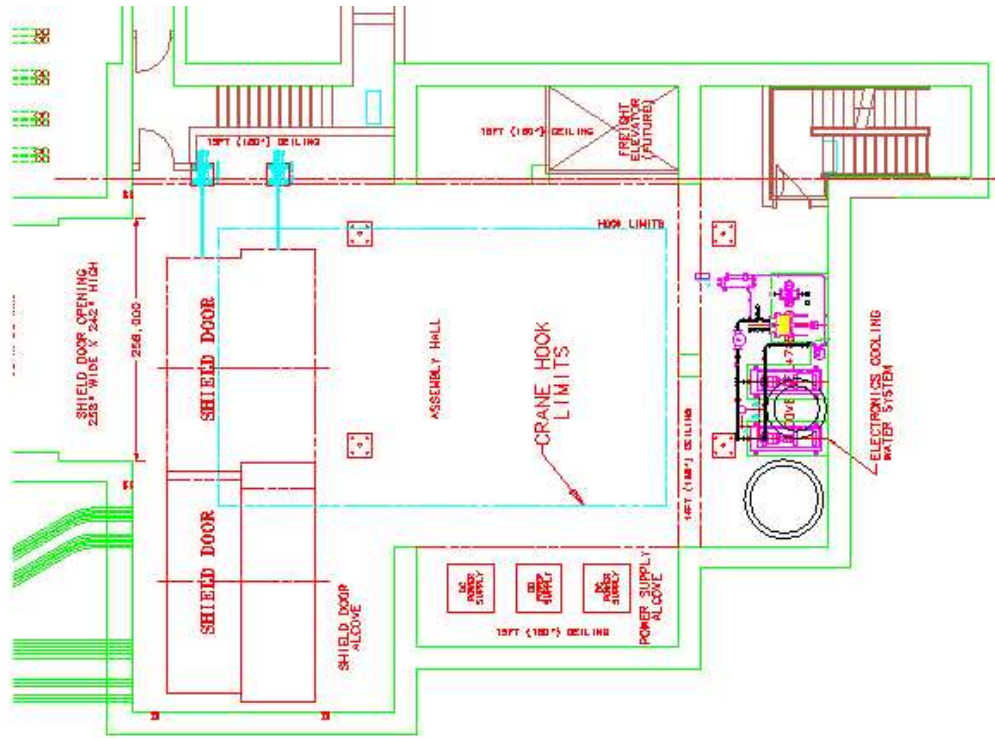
Layout of C0 Assembly Hall, showing crane coverage.
